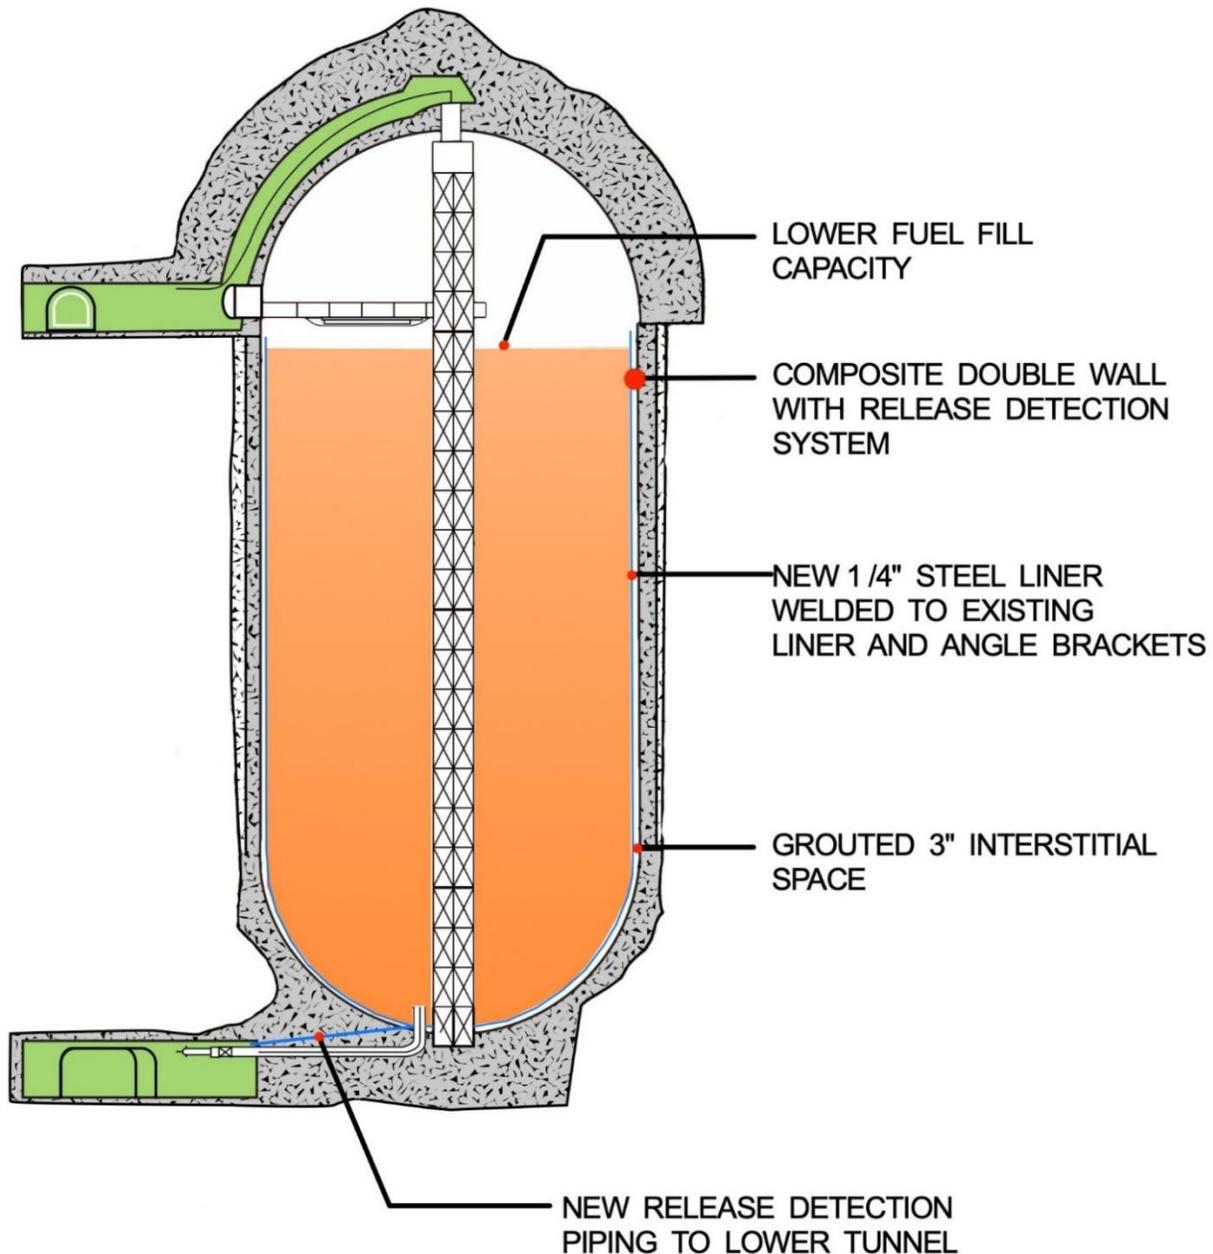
Tank Upgrade Alternative 2A/2B – Typical Tank Section
